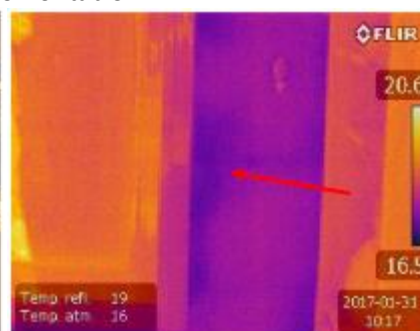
shows examples of the thermal images campaign carried out in Canyelles.
